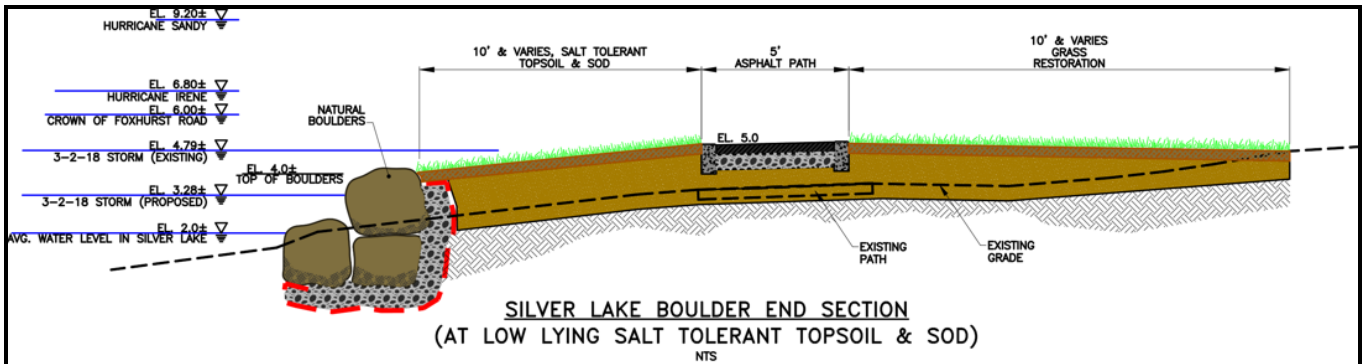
Conceptual Sections at Proposed Overlook Areas.
